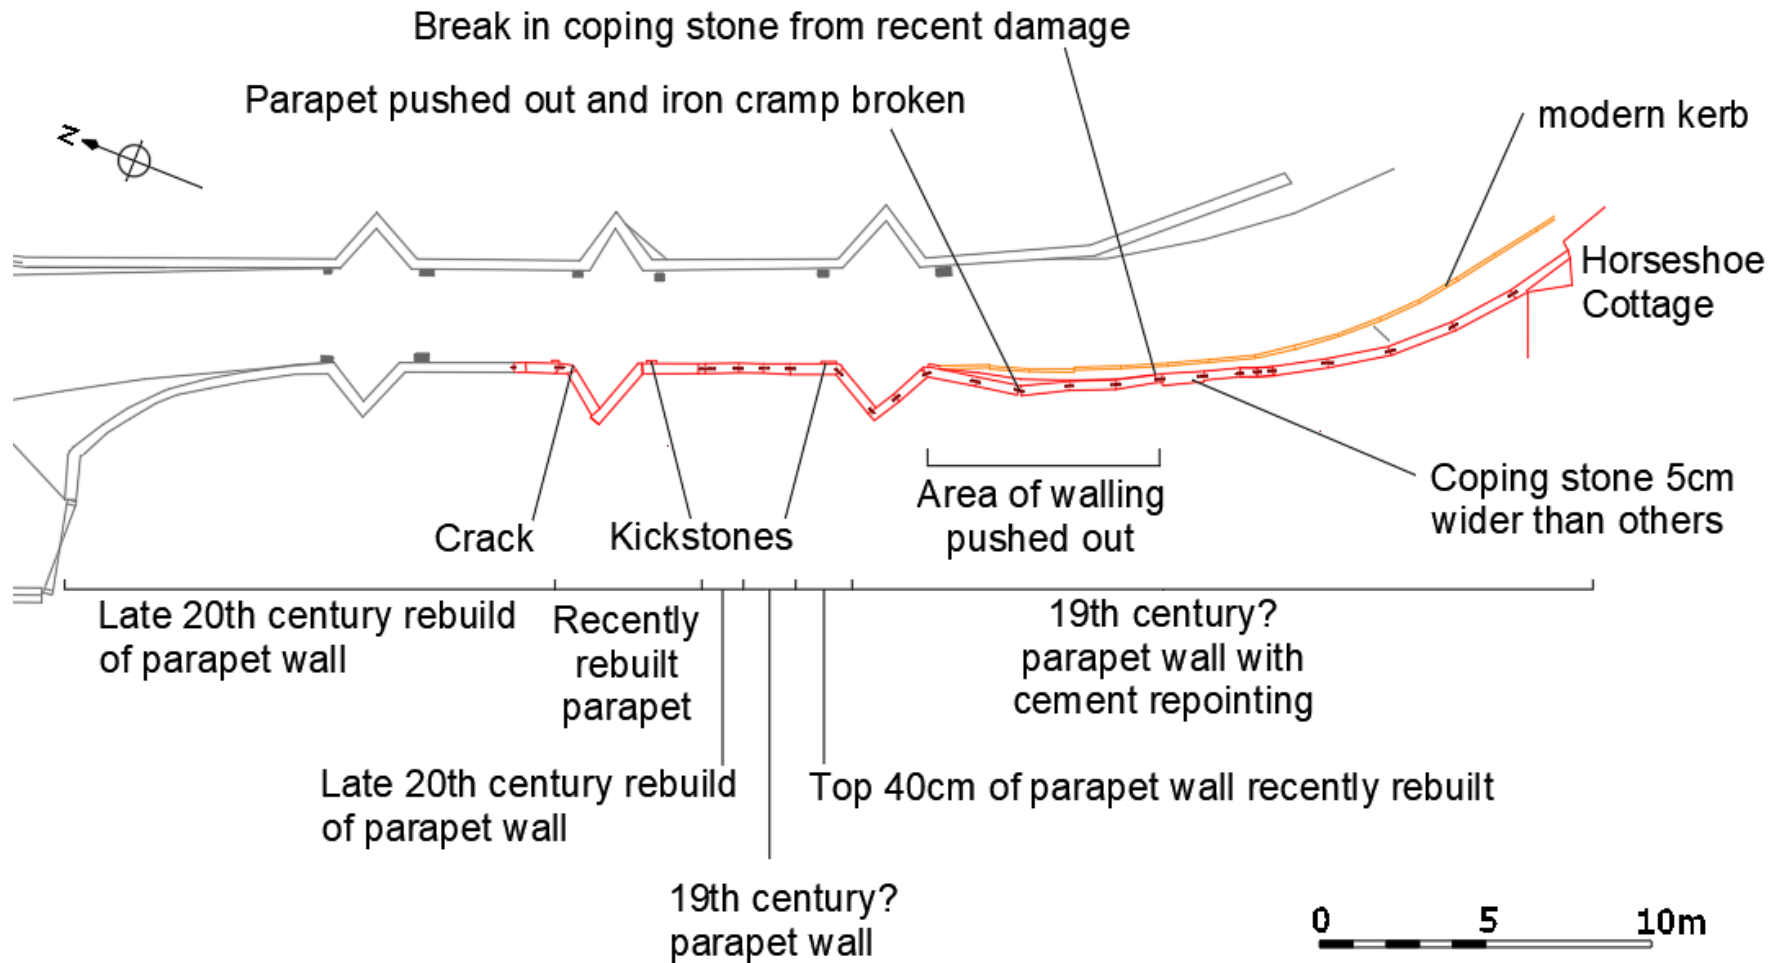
Plan of bridge prior to works with coping stones shown within and either side of the damaged area of wall.
